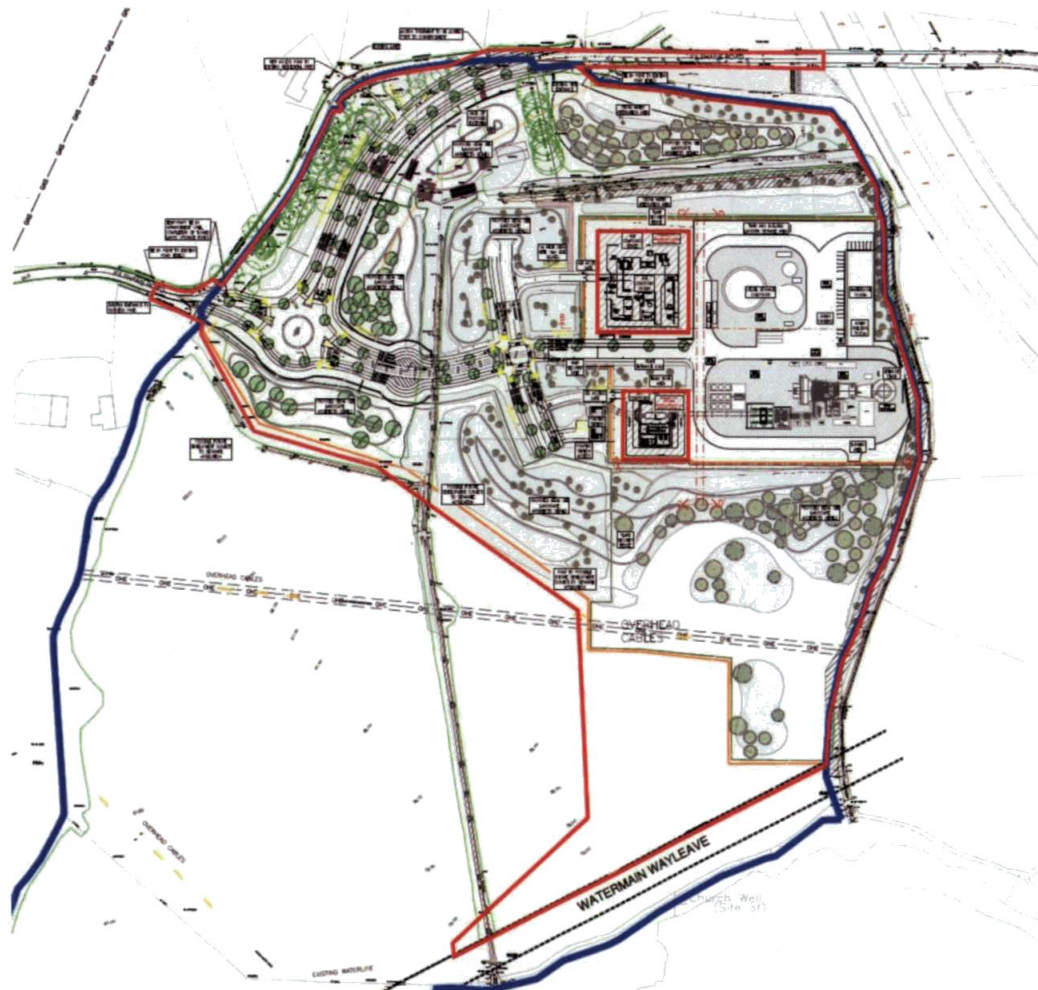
Layout of Proposed Development— note separate application will be made for a Gas-Insulated Switchgear Substation (GIS), Air Insulated Switchgear Substation (AIS) [also outlined in red] and grid connection to serve the development. and a subsequent Strategic Infrastructure Development (SID) application will also be submitted for an Above Ground Installation (AGI) compound [outlined in red], underground gas supply installation.
